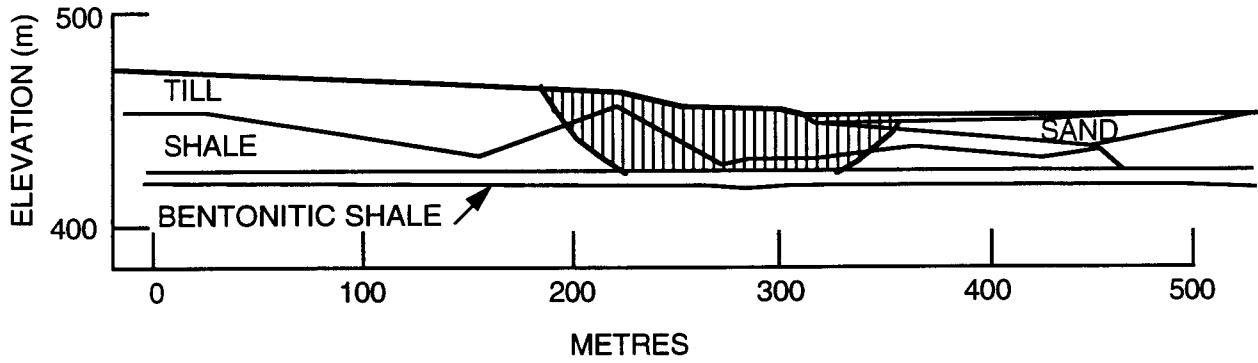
Typical Critical Slope Section, South Abutment, Borden Bridge
